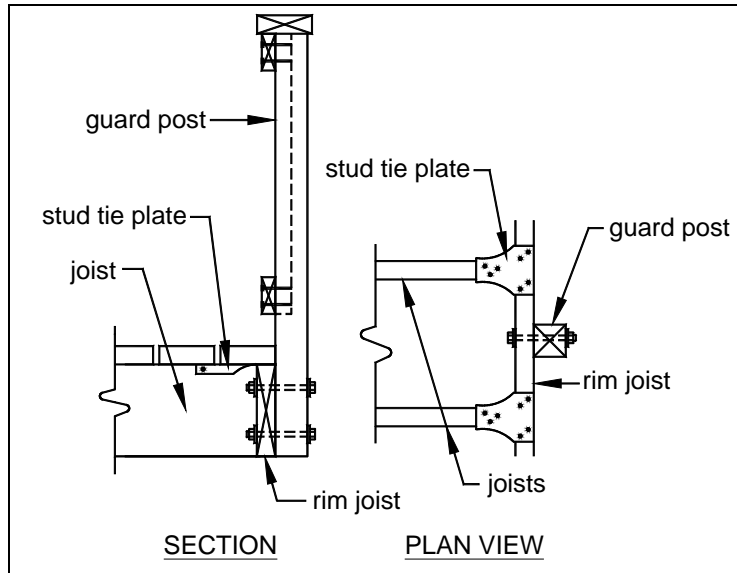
GUARD POST TO RIM JOIST DETAIL, OPTION 3
